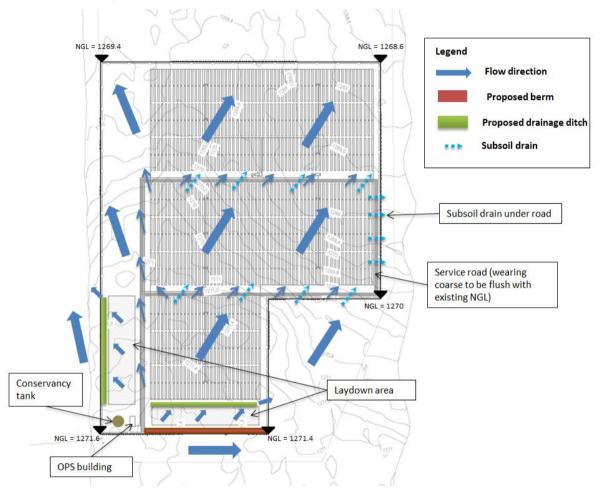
Conceptual Site Drainage and Stormwater Management Plan
